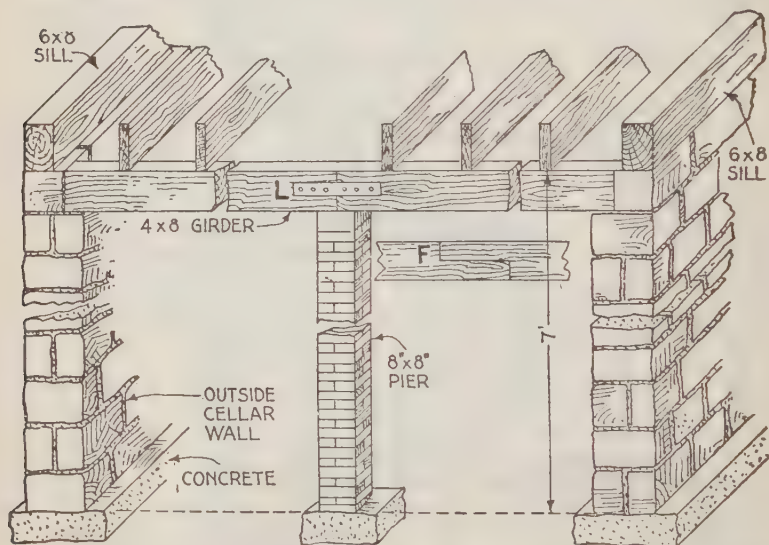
,808.—Cross section of cellar of small frame house showing foundation, pier, girders, sills and floor beams. Where the girder is made up of more than one piece, the lengths are usually butt jointed as shown at L, but sometimes a half lap joint is used as at F.
